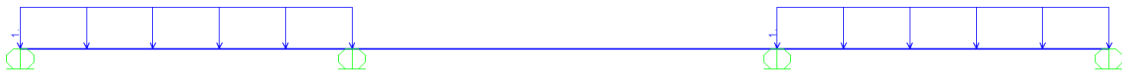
Story County bridge - controlling truck loading conditions for pier reactions
